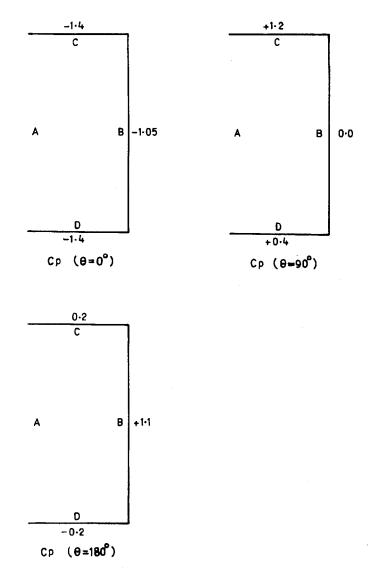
A RECTANGULAR CLAD BUILDING WITH MONOSLOPE ROOF (Continued)
